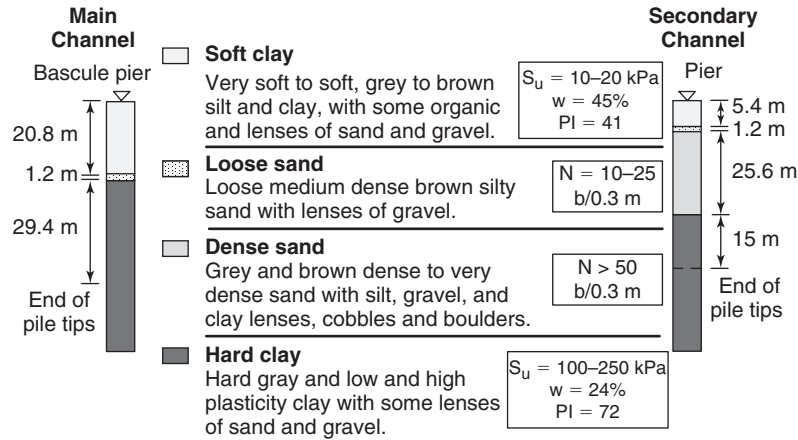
Soil stratigraphy at the location of the New Woodrow Wilson Bridge.
